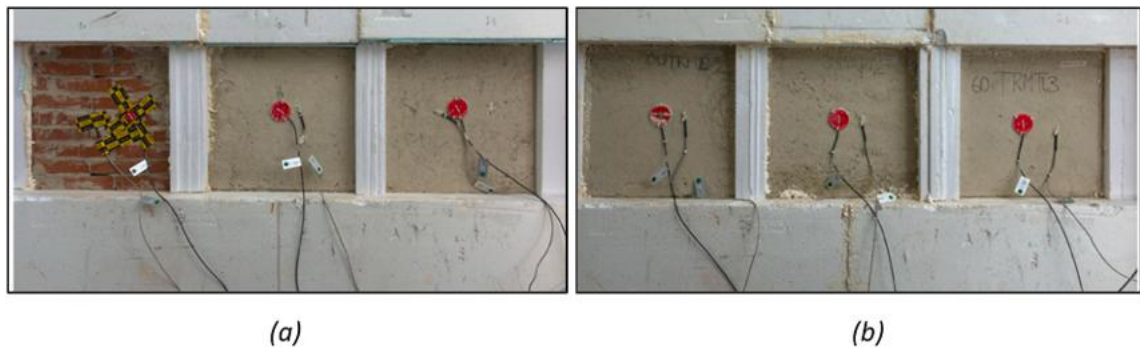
Thermal conductivity test setup, wall specimens: (a) 60NR, 60TRMTLD, and 60 TL, and (b) 60TRMD, 60TRM, and 60TRMTL.
